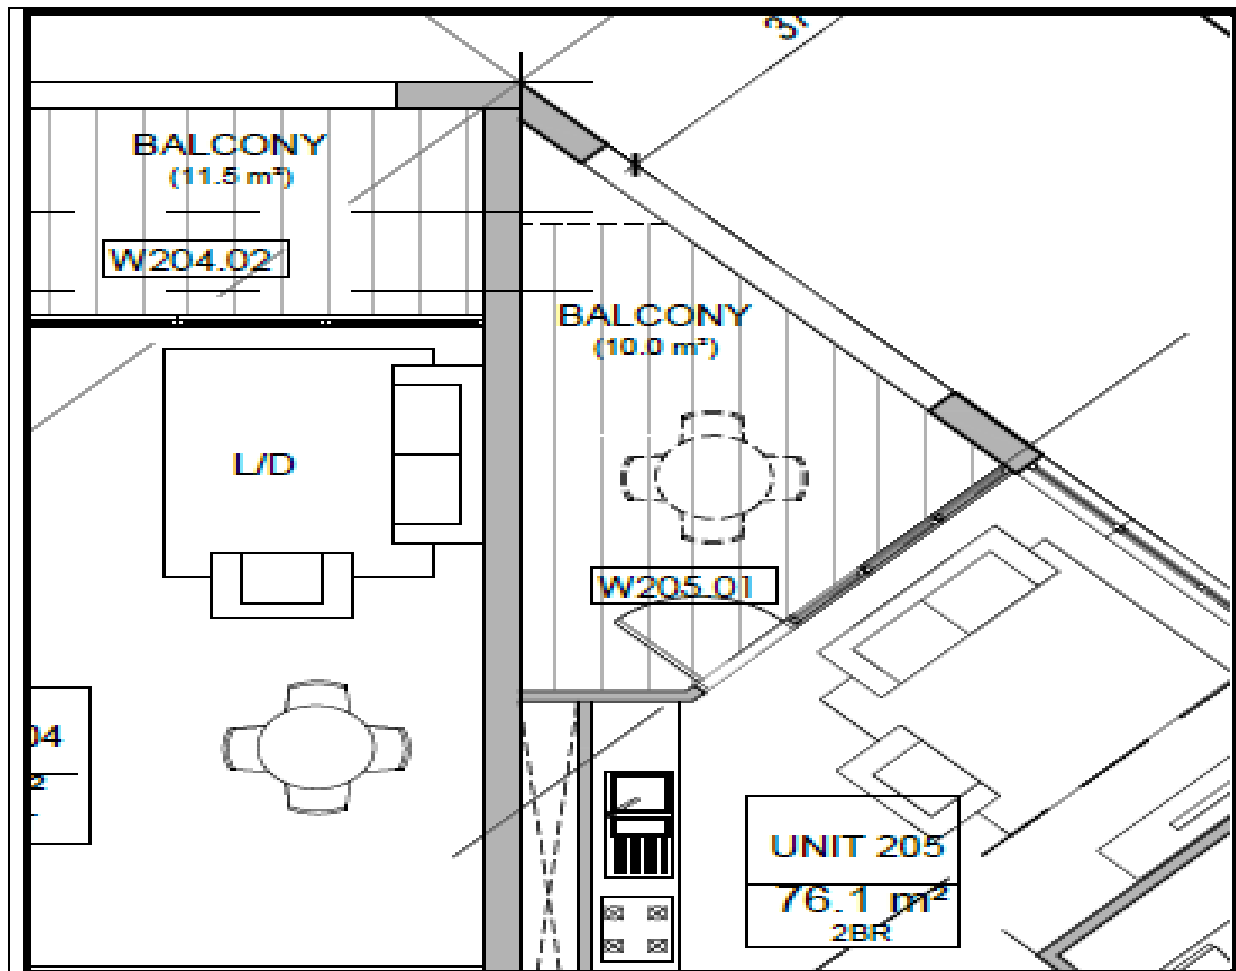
Floor plan showing primary balcony of 2 bedroom apartments as described above
